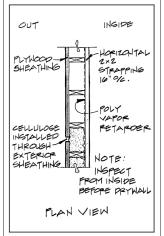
One way to use dry cellulose loose-fill in new construction is to install it through holes in the exterior sheathing before the drywall is installed. This allows visual inspection of the installation. Horizontal 2x2 strapping holds the vapor retarder in place.
